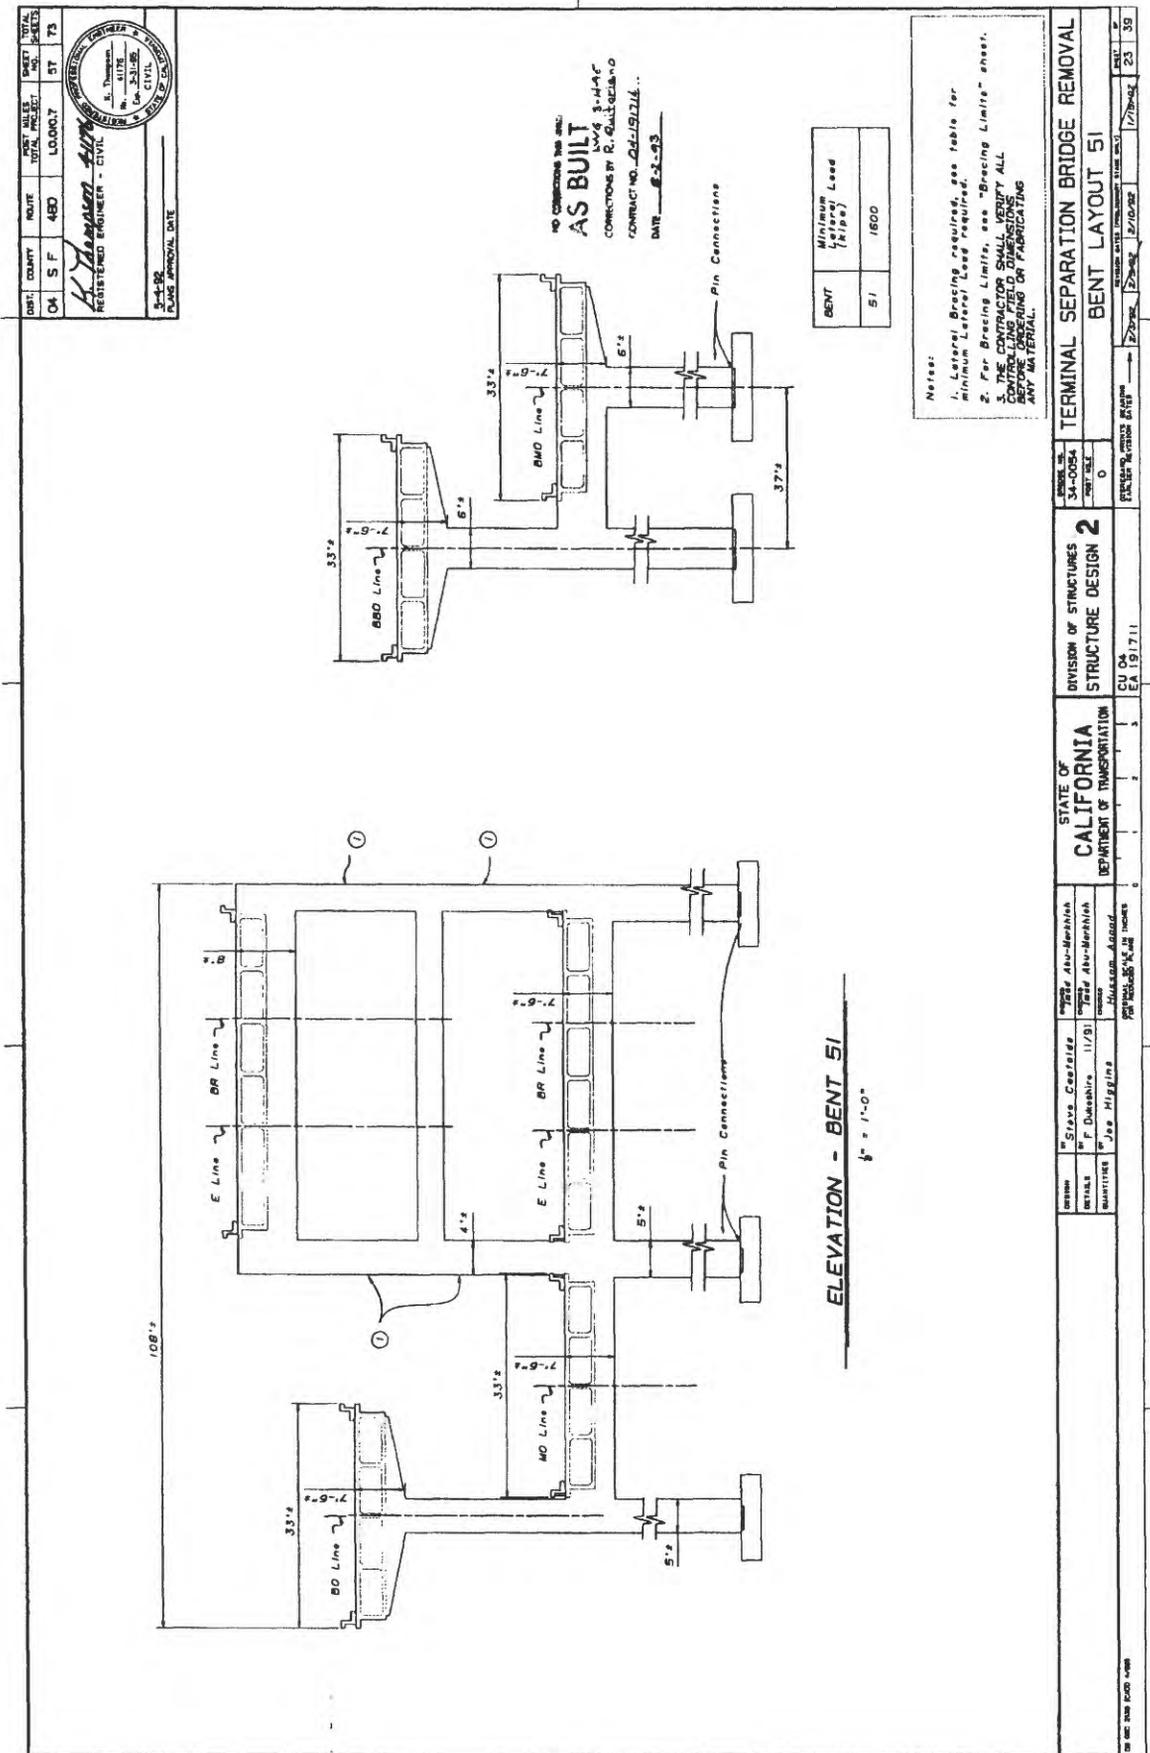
Elevation drawing of Bent 51 at Terminal Separation.
